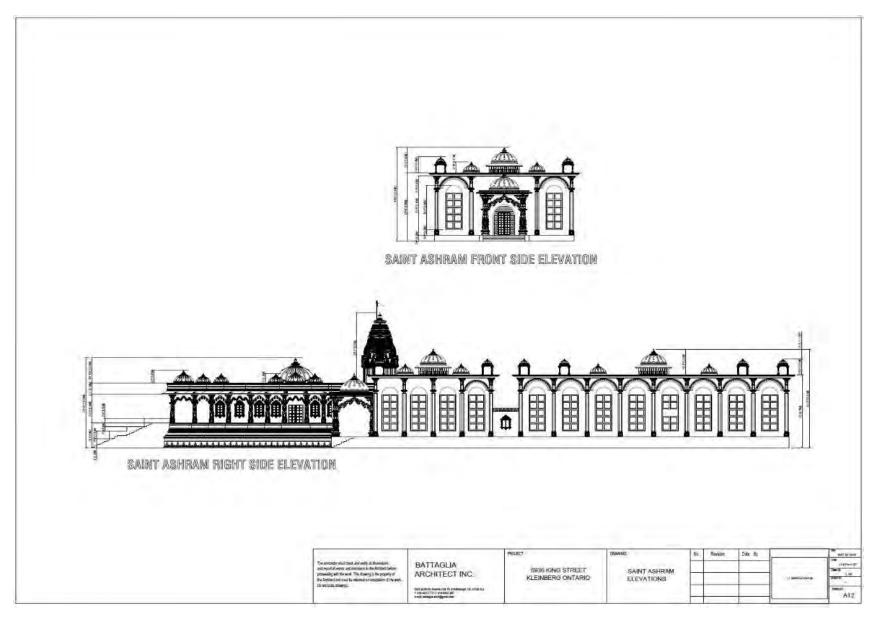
Proposed Saint Ashram elevations (Battaglia Architects Inc.)
